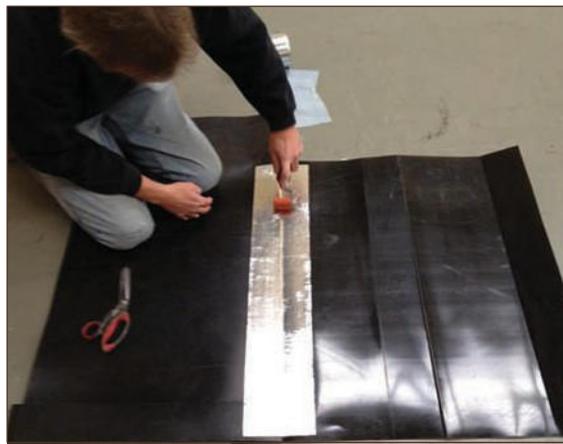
Example HDPE type gas membrane and steam roller used to ensure self-adhesive tape is correctly installed (courtesy A Proctor Group)
